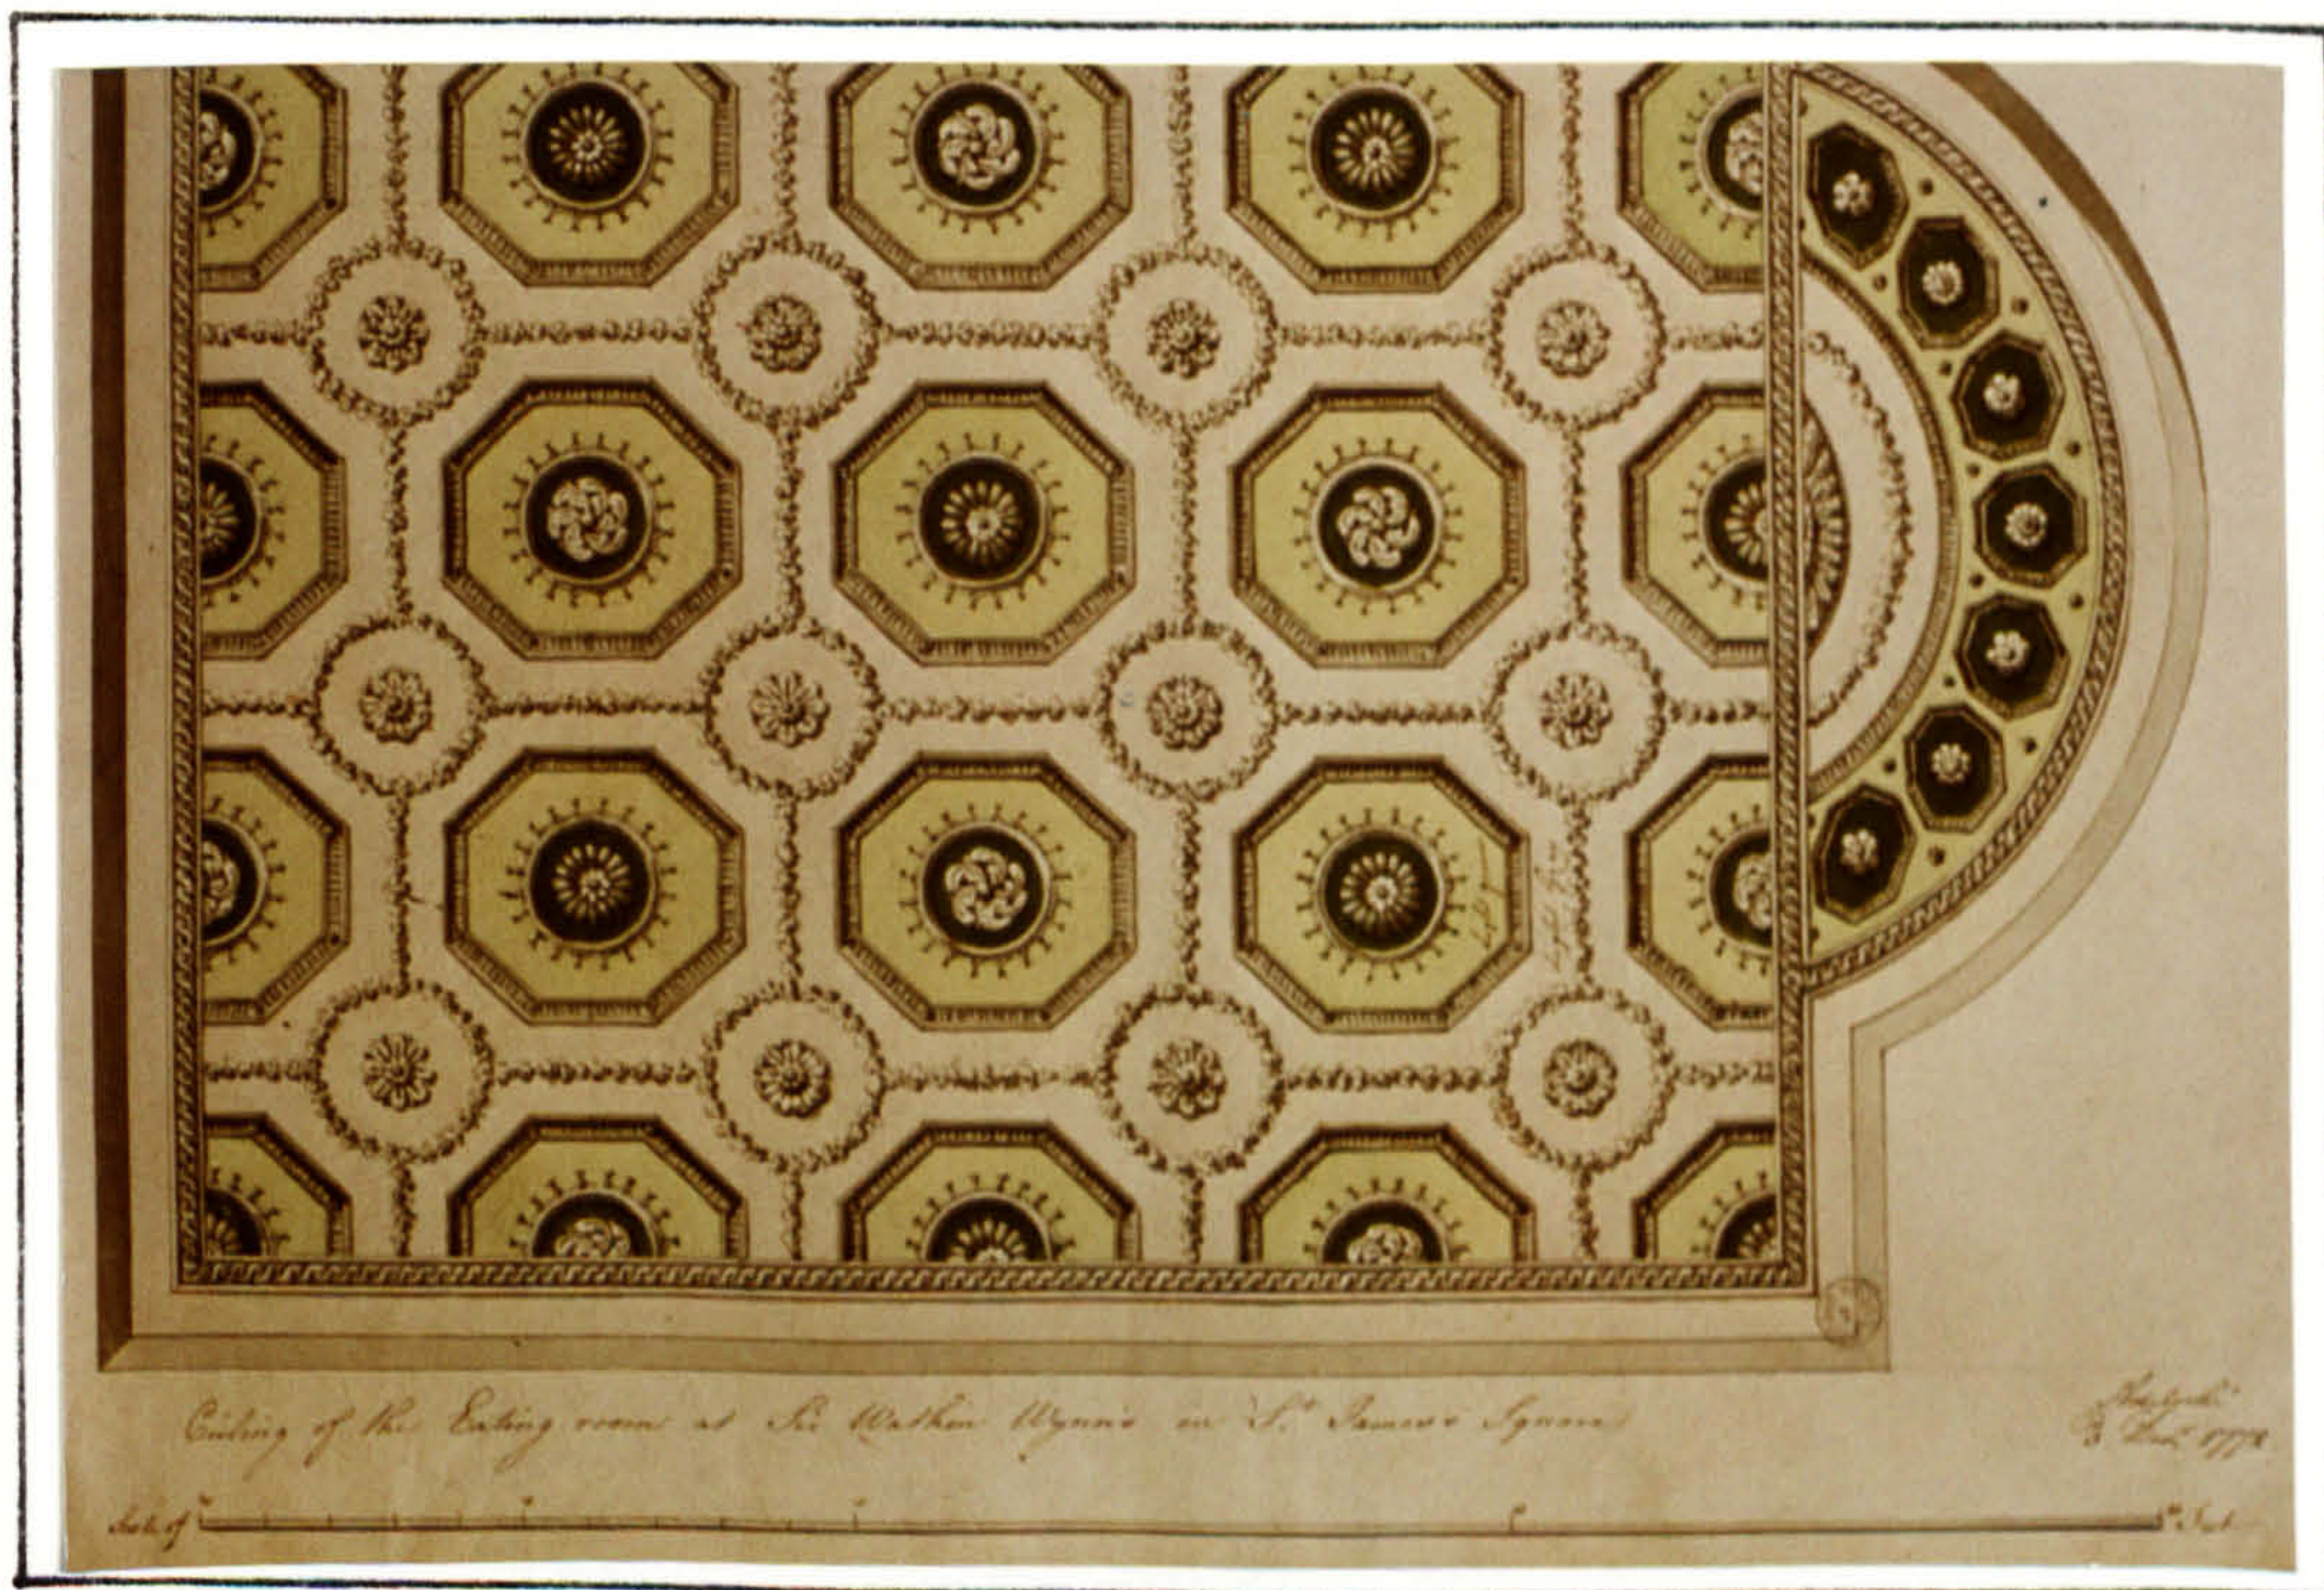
ROBERT ADAM · CEILING FOR EATING ROOM · 20 ST. JAMES'S
